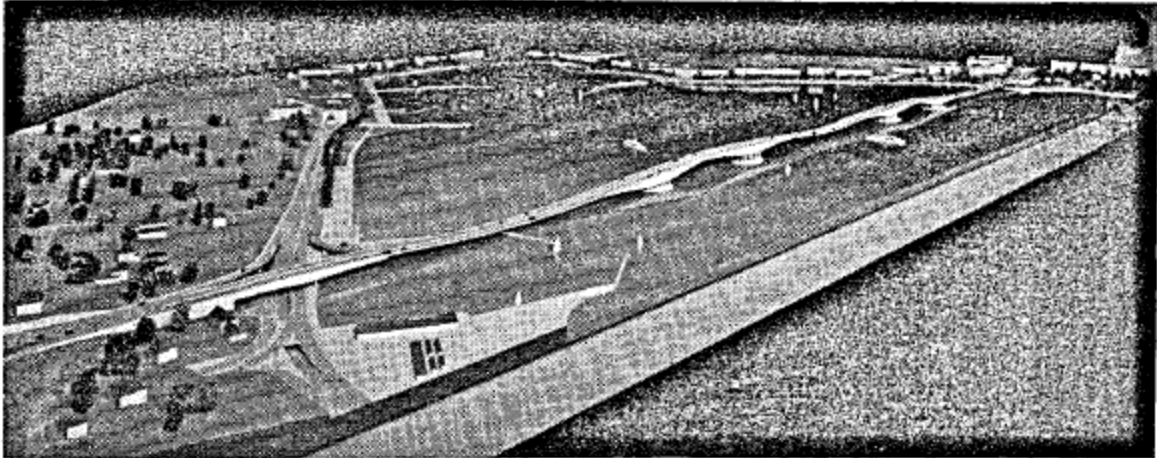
Model of Proposed Stress Ribbon Bridge at Lake Geneva (Finsterwaler 1965)
